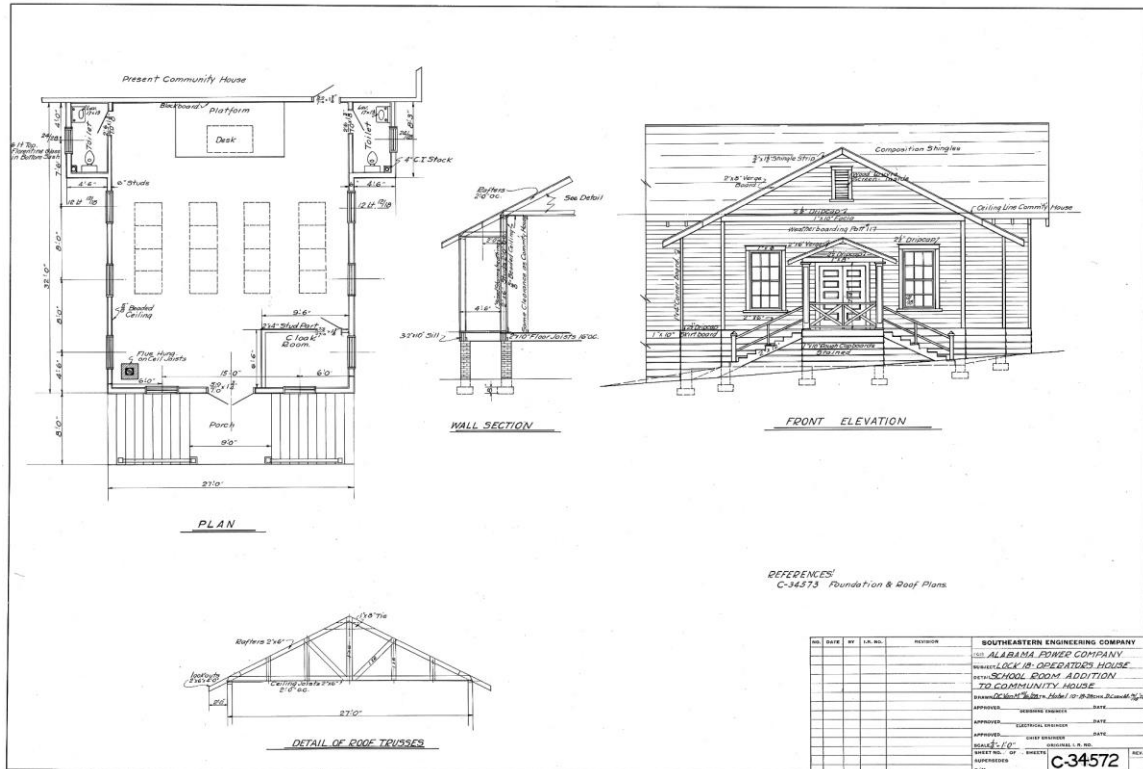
Jordan Dam School Addition 10-18-1928.
